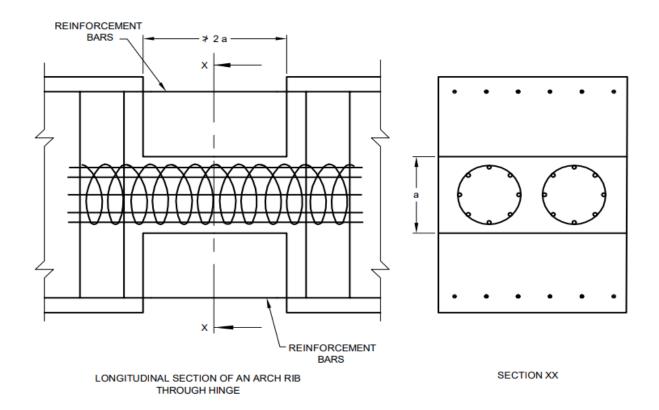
TYPICAL TEMPORARY HINGE (CONCRETE NOT SHOWN)
